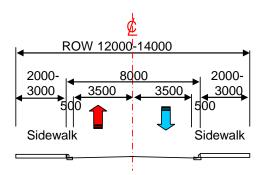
Typical Cross Section of Inner Ring Road (Single Carriageway)
